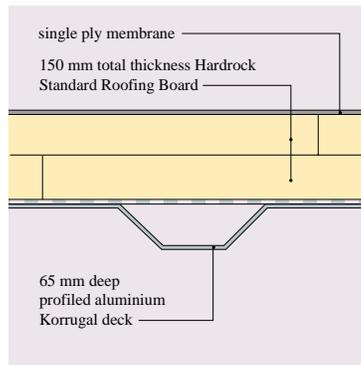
Flat roof detail, Stansted Airport, with Rockwool Hardrock Roofing Board - Sound reduction index = 44 dB.
